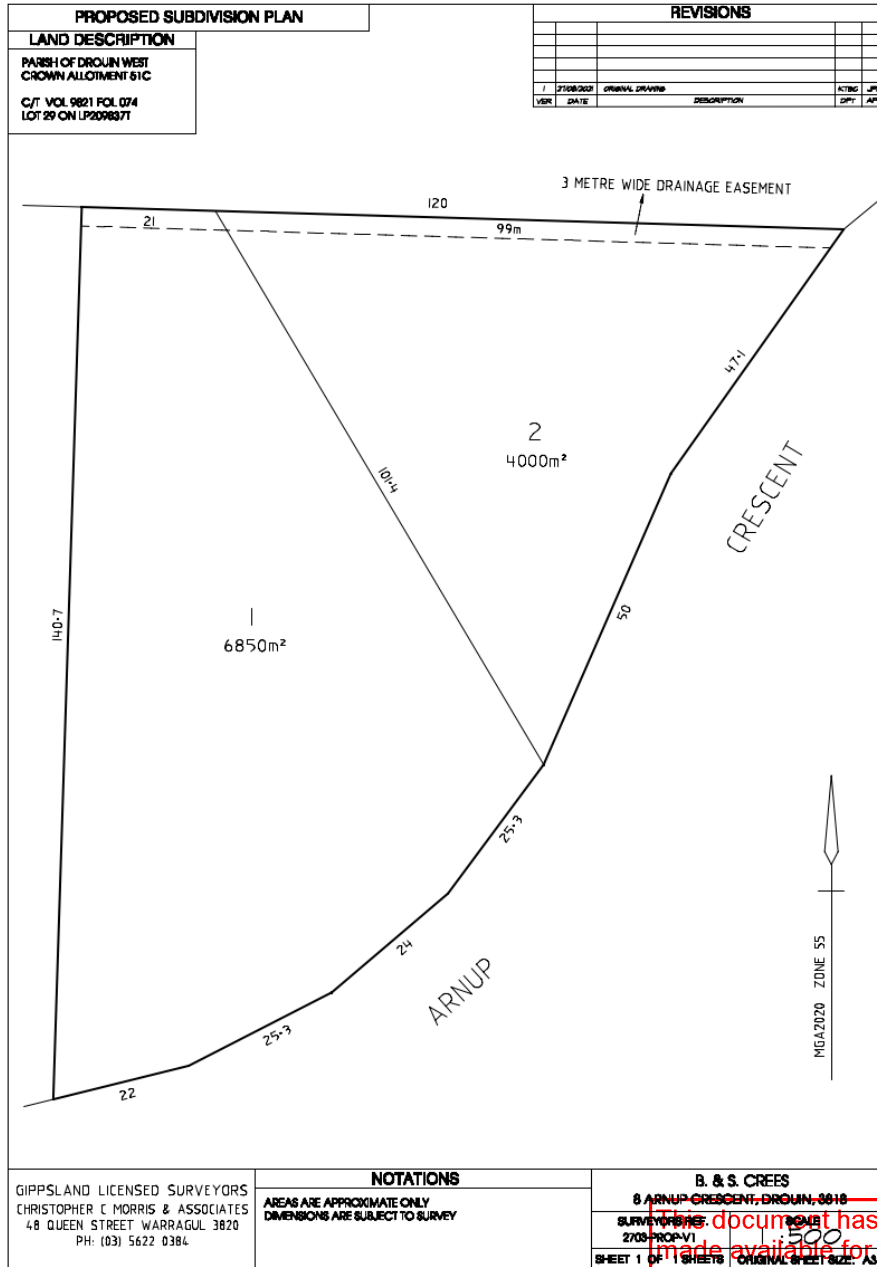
PROPOSED SUBDIVISION PLAN TO BE ENDORSED UNDER THIS PERMIT
